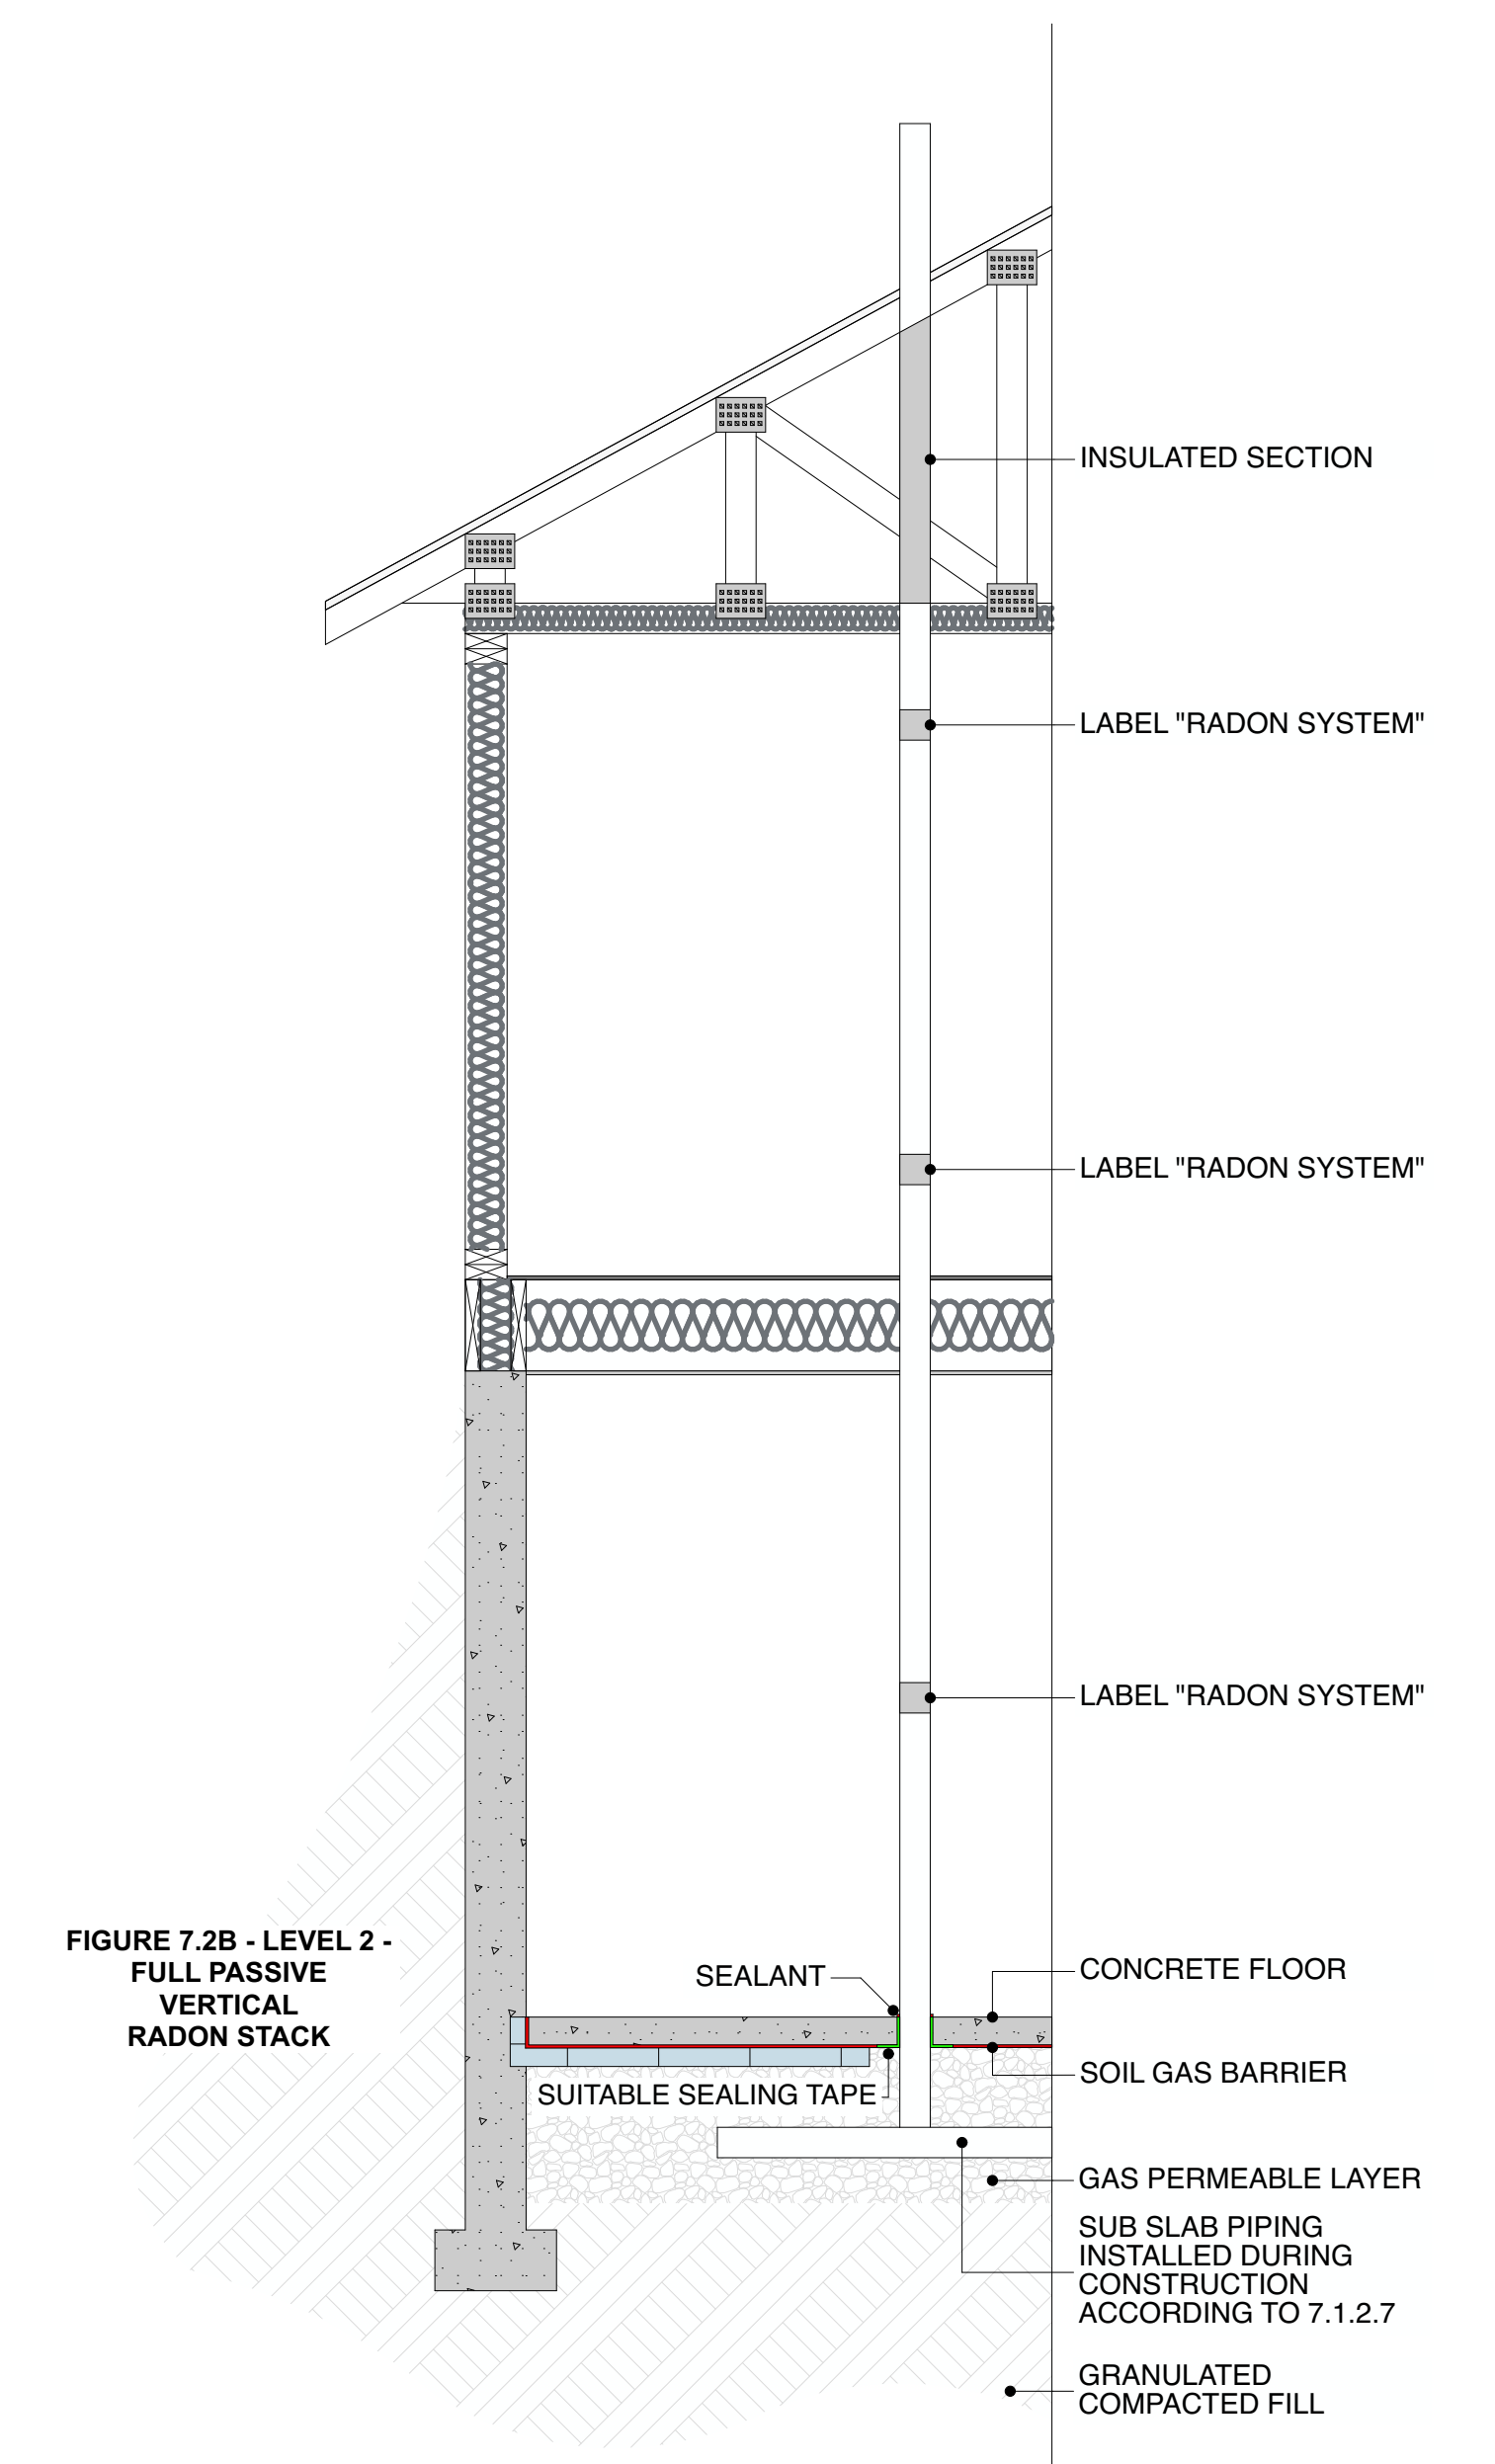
B - LEVEL 2 - FULL PASSIVE VERTICAL RADON STACK
